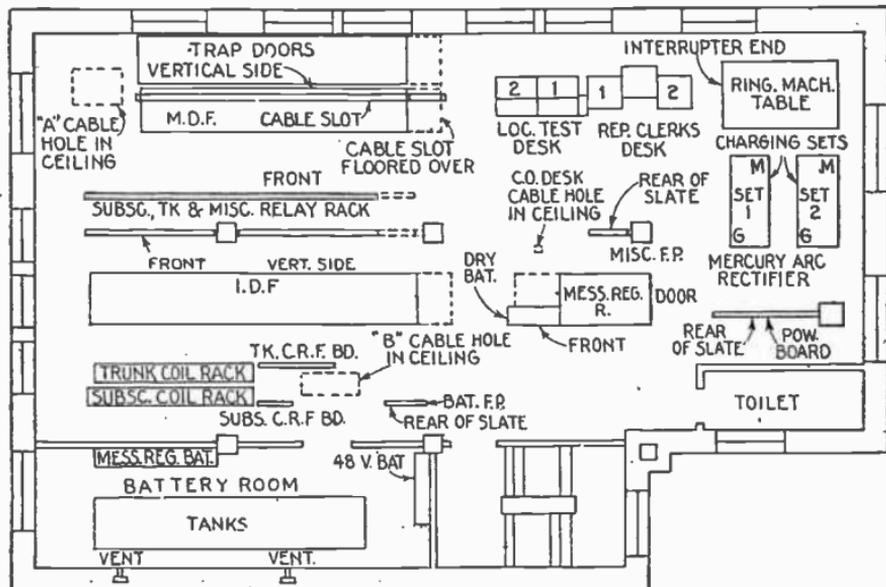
,530.—Typical layout of a Central office terminal room which also contains the power plant equipment.
